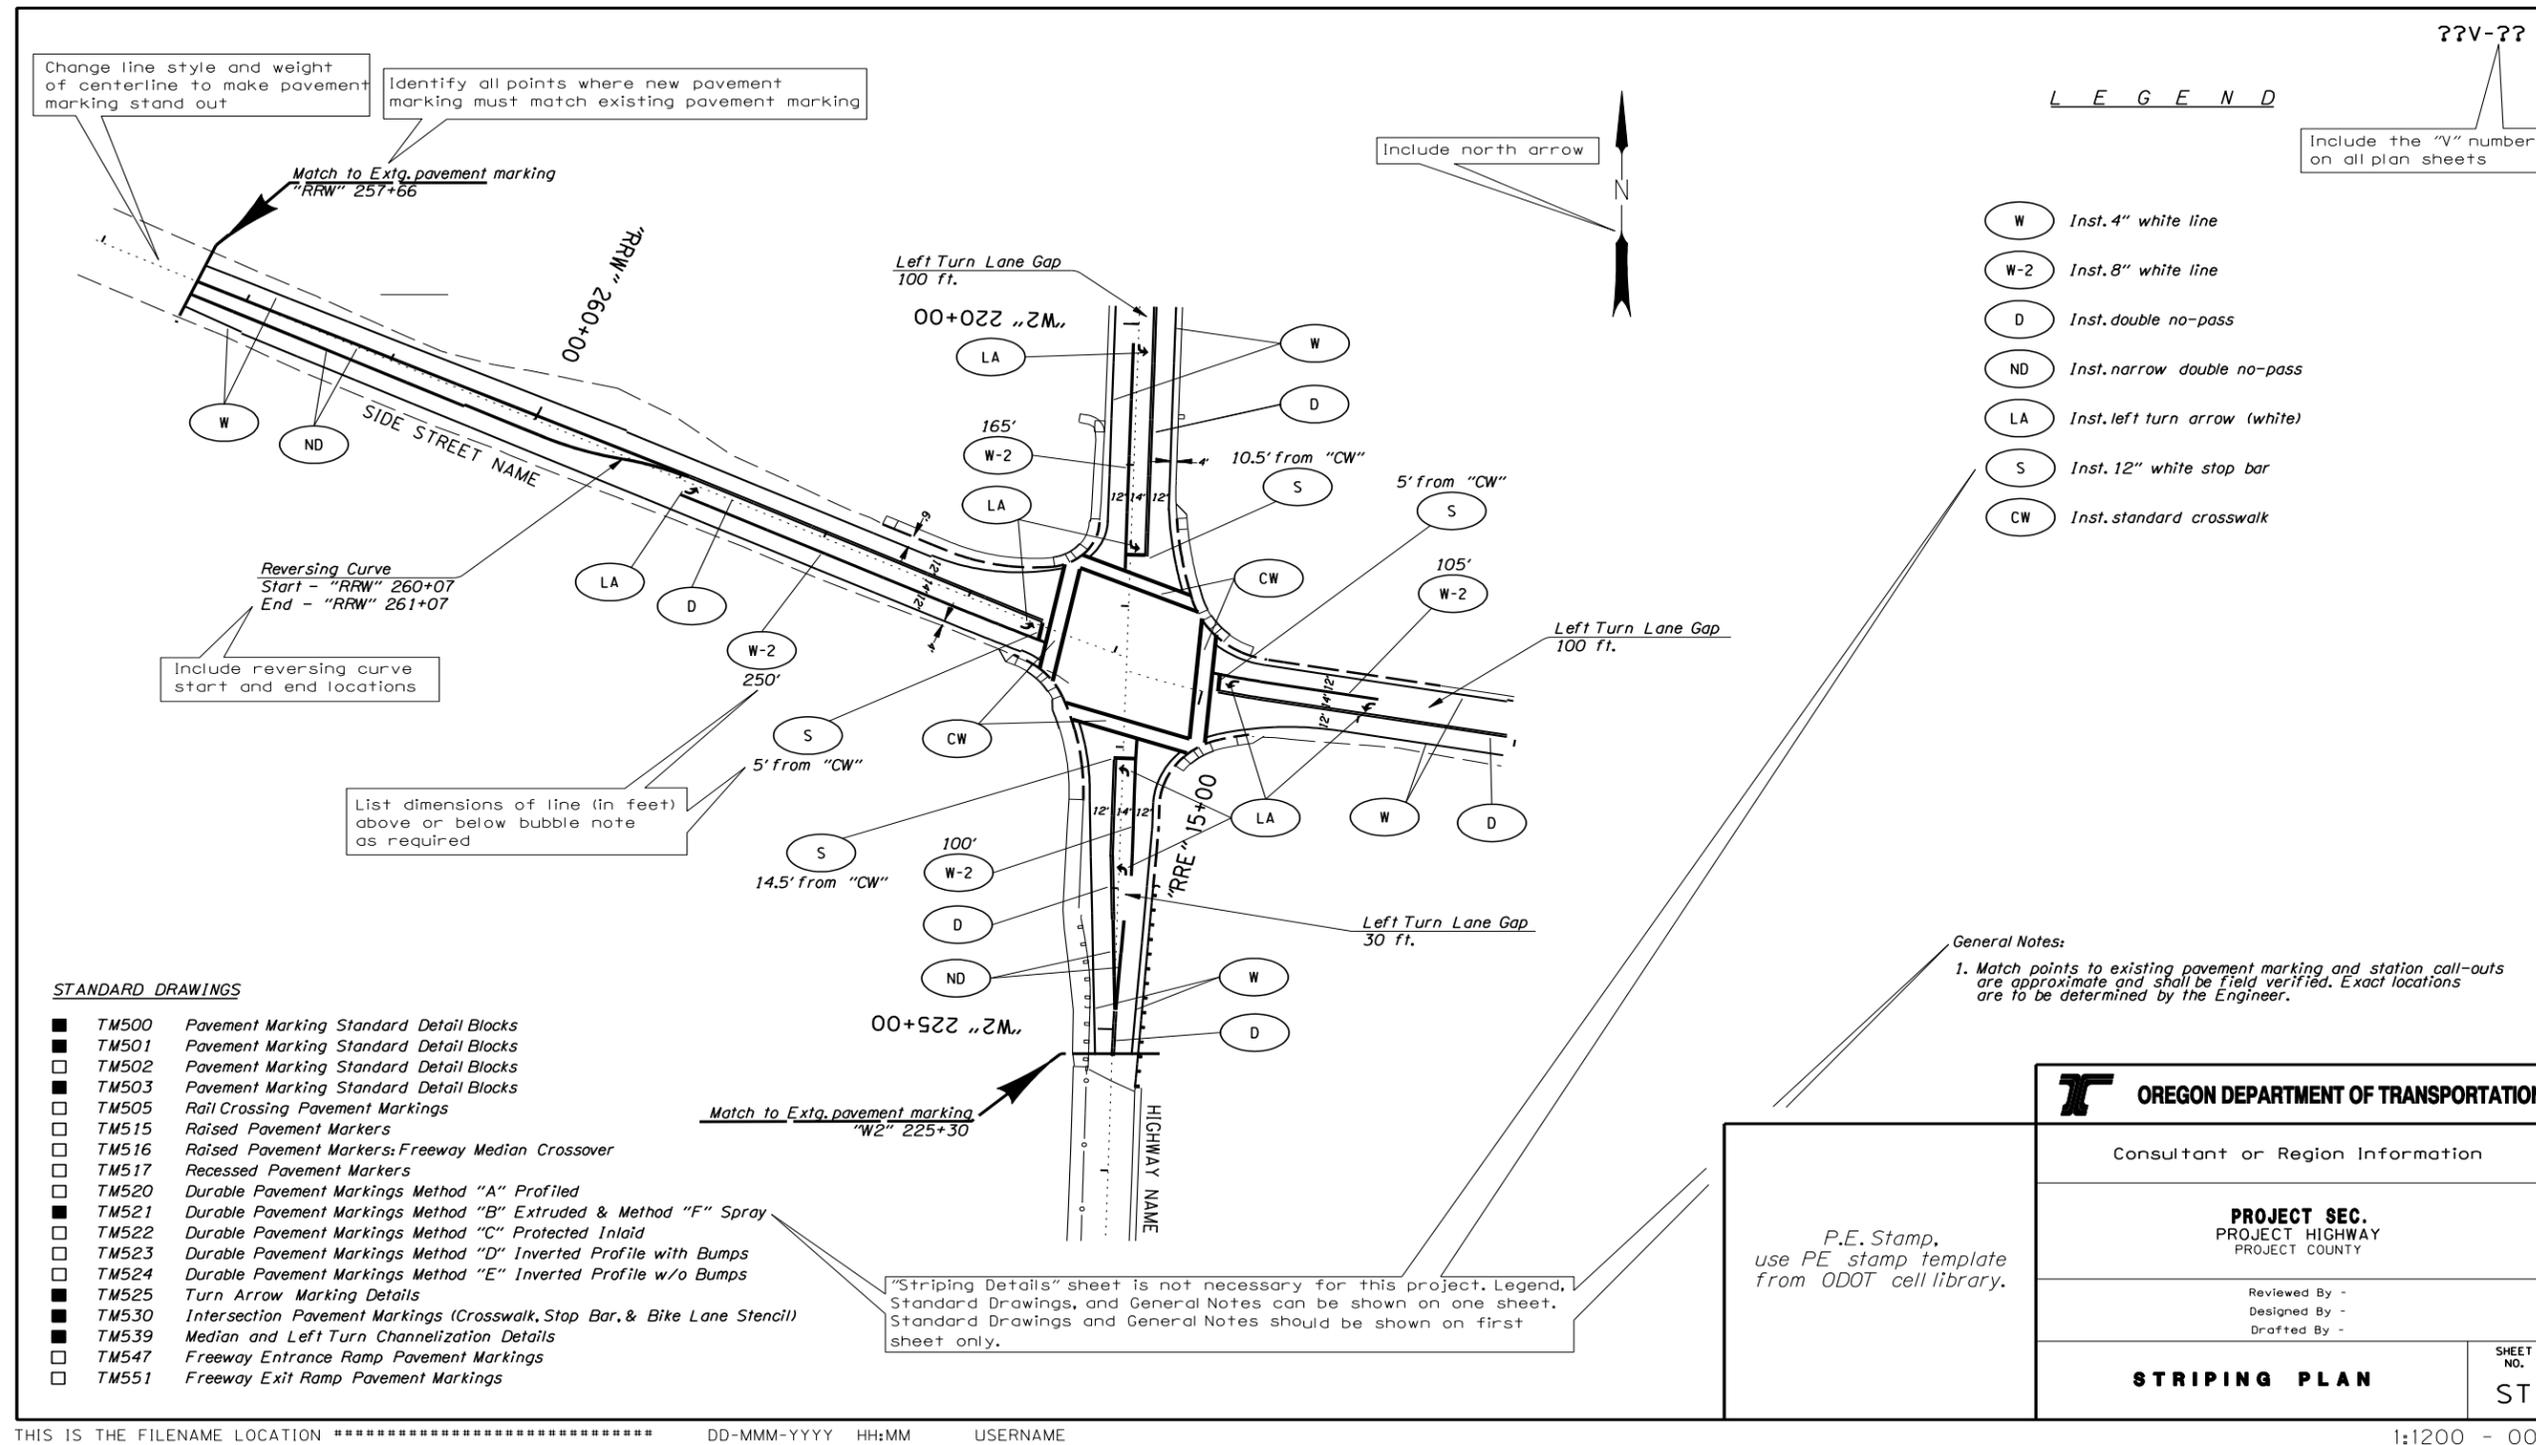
Striping Plan Sheet When a Striping Details Sheet is Not Used (2)
